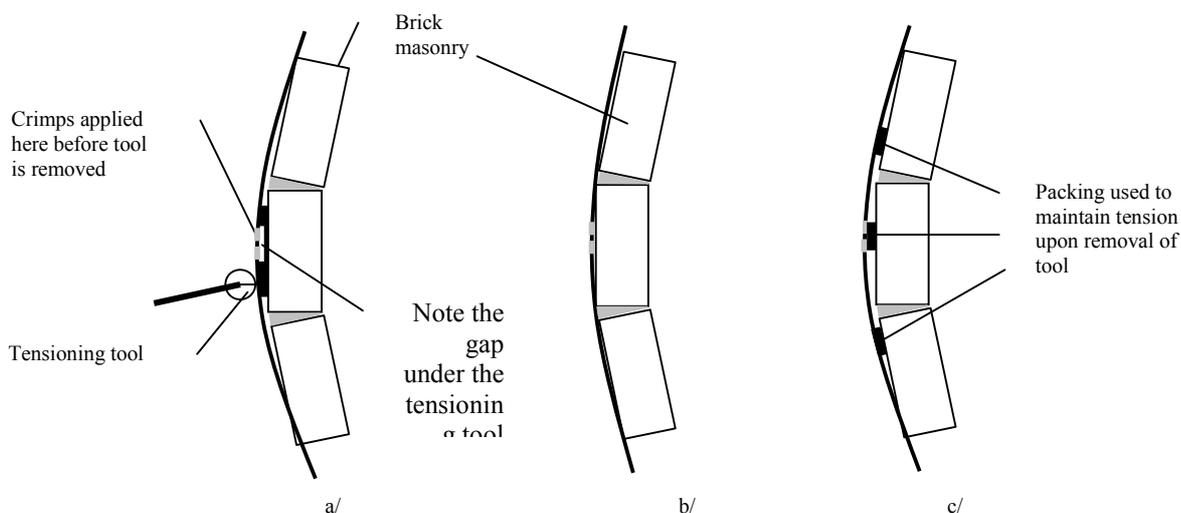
showing tensioning and crimping arrangement for steel strapping a/ during the tensioning and crimping process b/ when crimping is complete and the tensioning tool has been removed and tension reduced c/ maintaining tension by using packing
